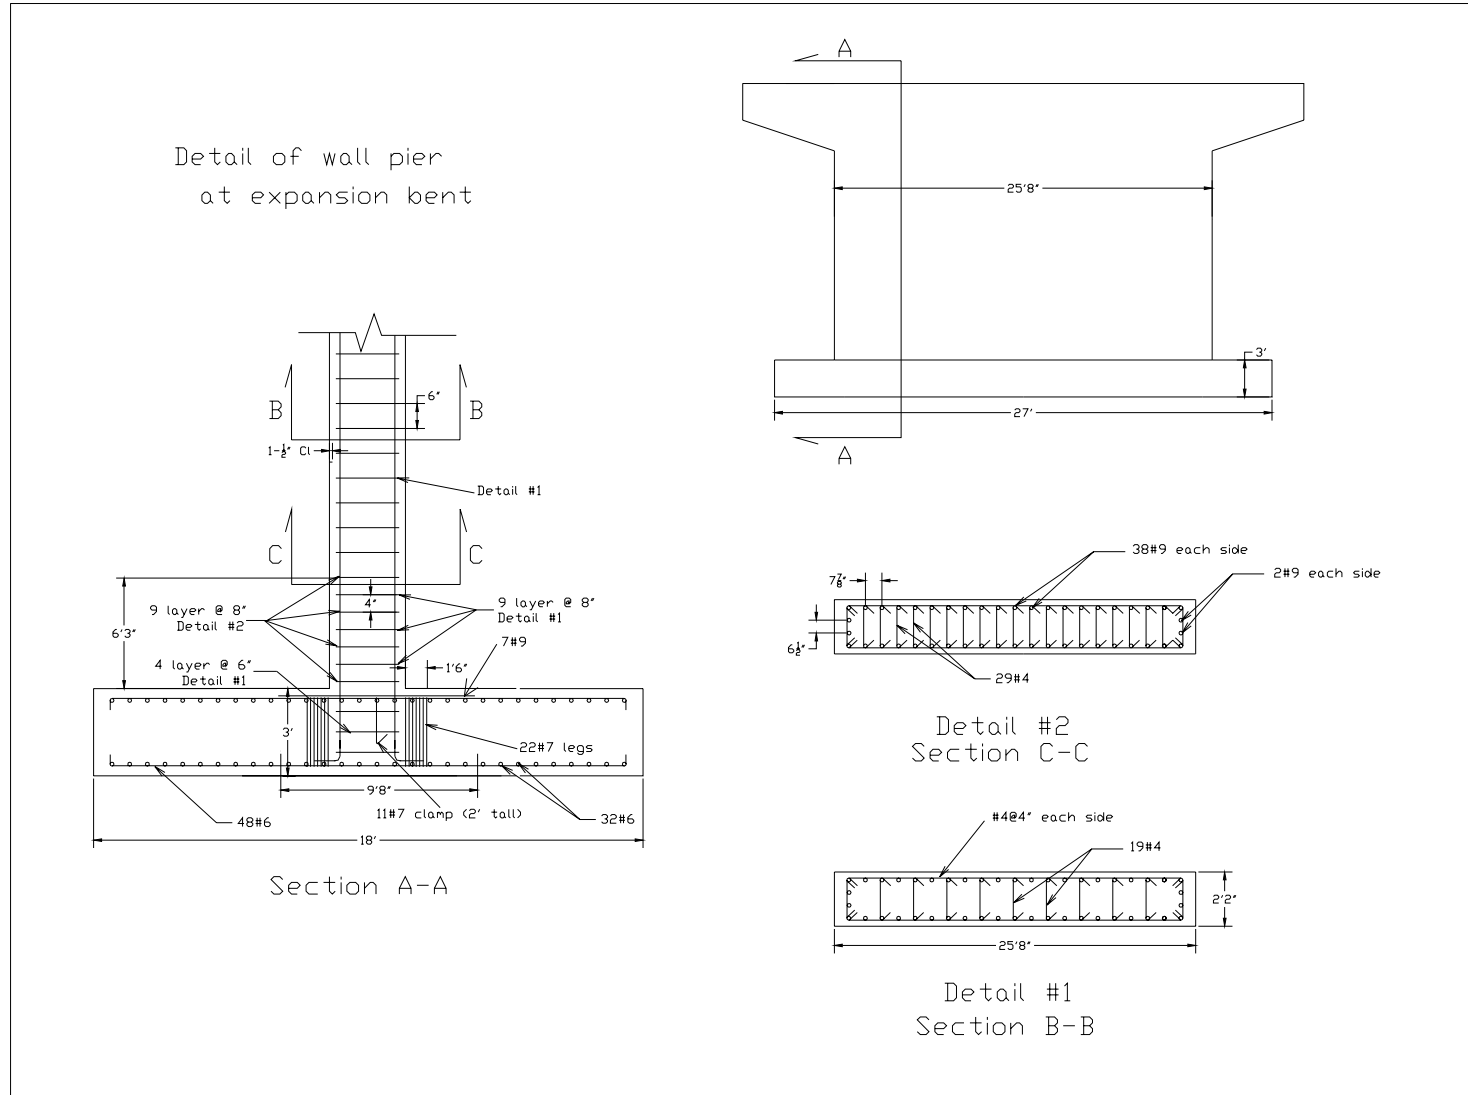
NCHRP Wall Design Details for Expansion Bent
